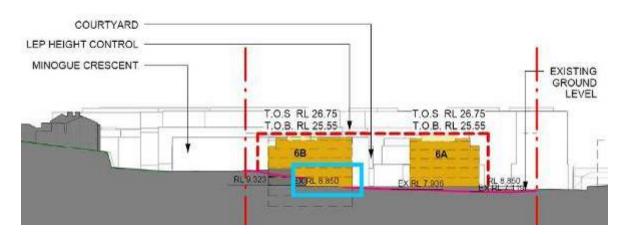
Section through Precinct 6, looking north. Two additional storeys are proposed to the courtyard on Building 6B.
